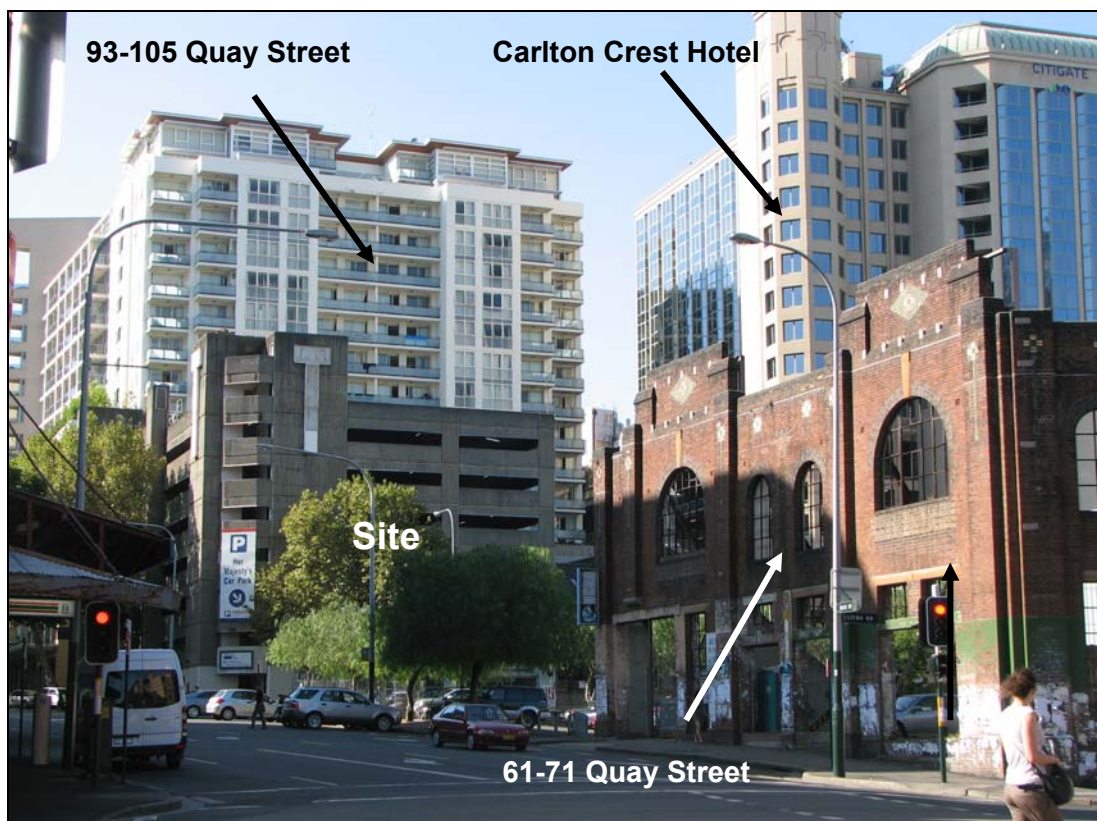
Site as viewed from Quay Street looking south and showing surrounding development.
